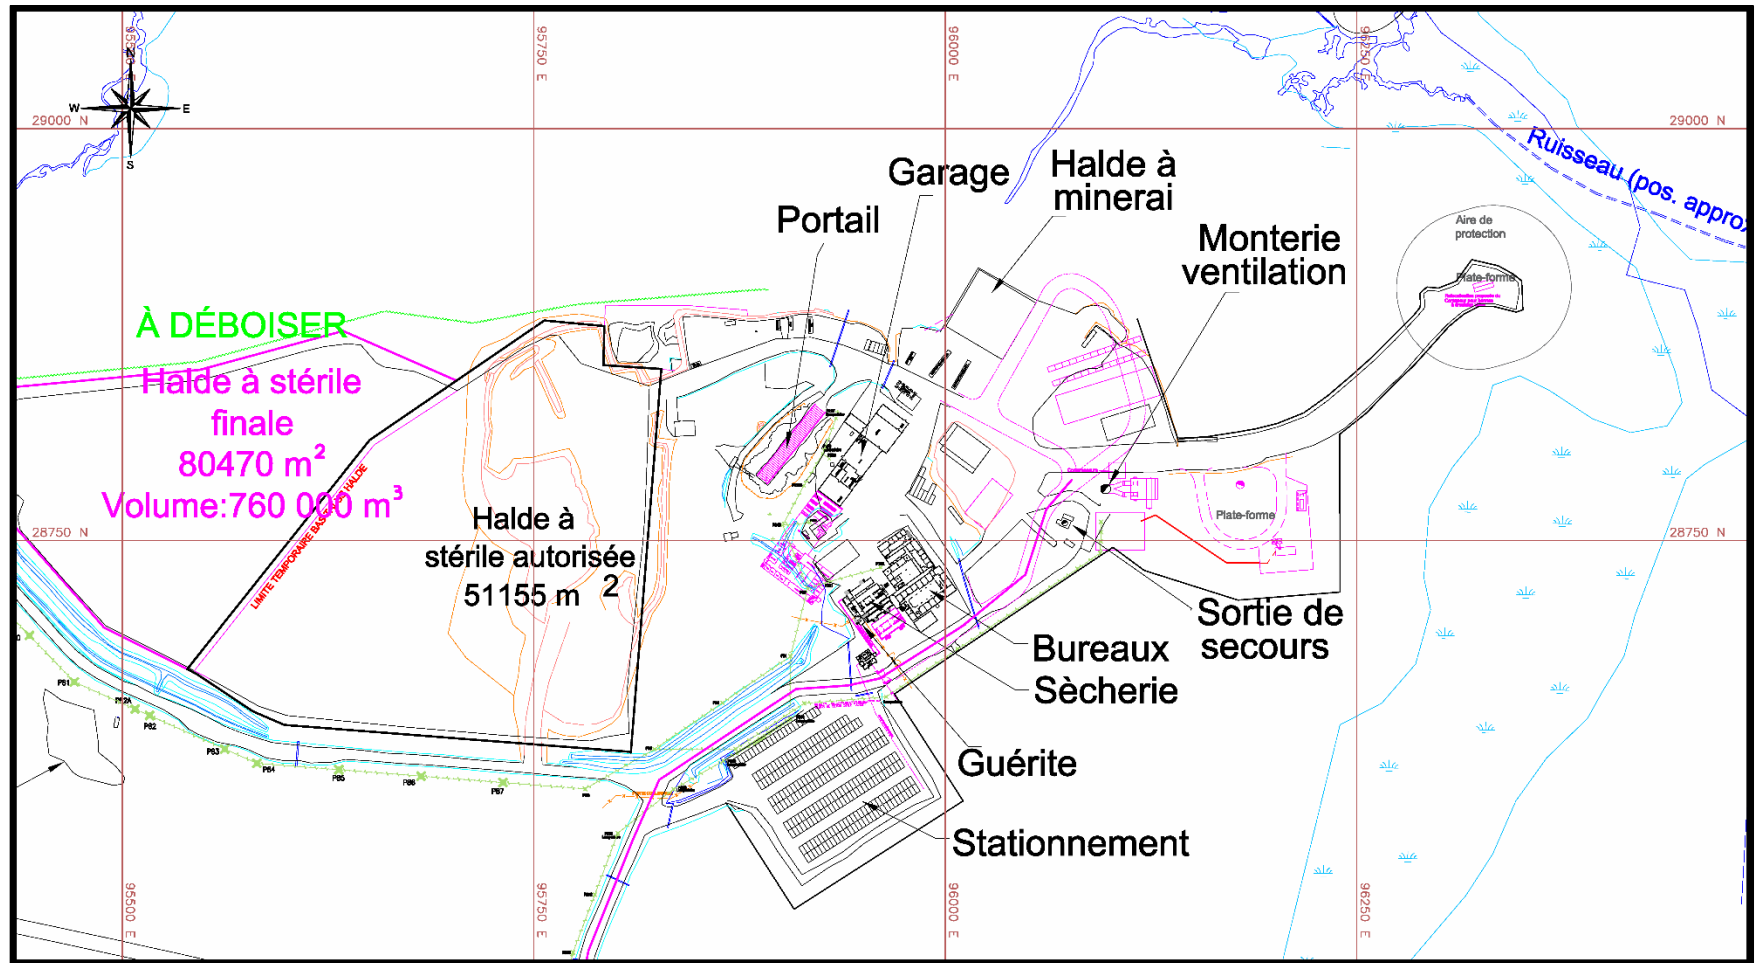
Final Surface layout of Triangle Mine Site (pink to build)
